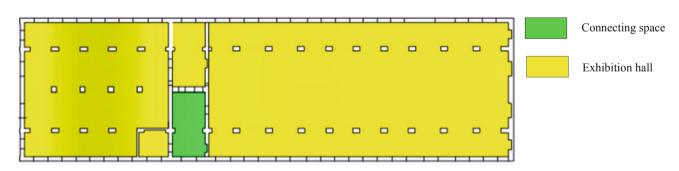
Recovery plan, first floor plan (drawing by M. L. Longo)
